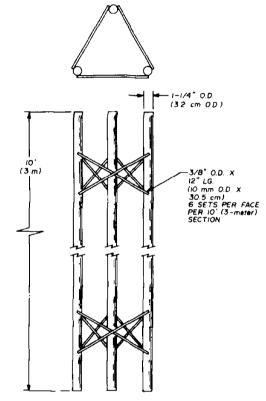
Dimensions of a typical 10-foot triangular tower section.
